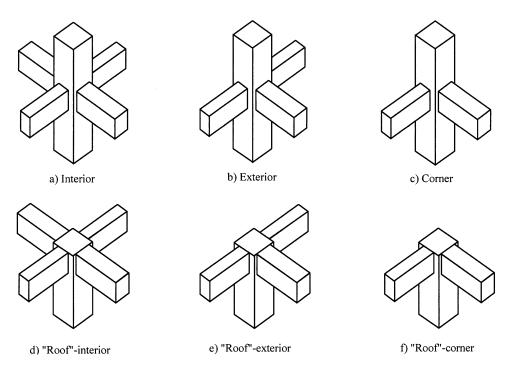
Typical beam-to-column connections (slabs not shown for clarity). Wide-beam cases not shown.
